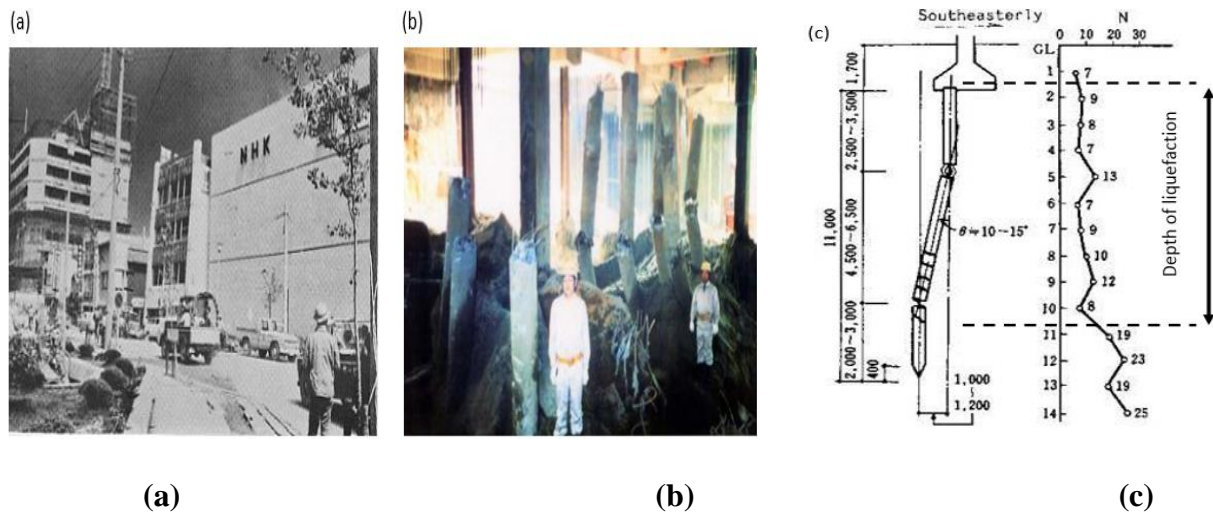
a Tilting of NHK building b Observed damages of piles after excavation and c Failure pattern of pile of the building following the 1964 Niigata Earthquake (Dash and Bhattacharya, 2012)
